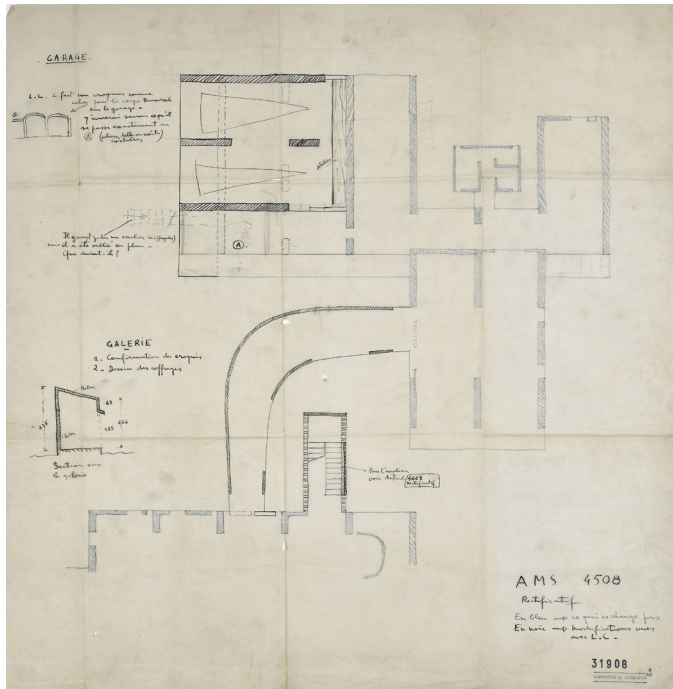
Floor plan sketch of the garage and gallery (FLC 31908).
